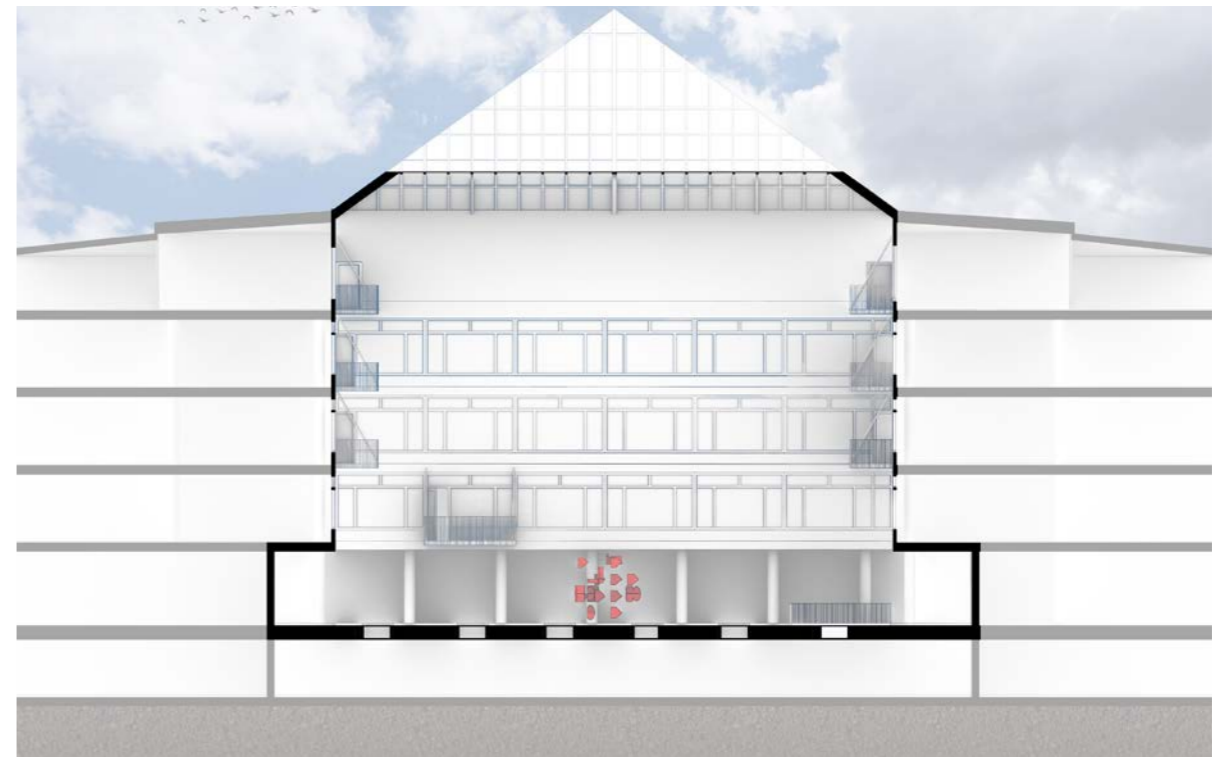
West elevation CC of Installation one and the atrium 1:350 0 4 8 12 16 20m
